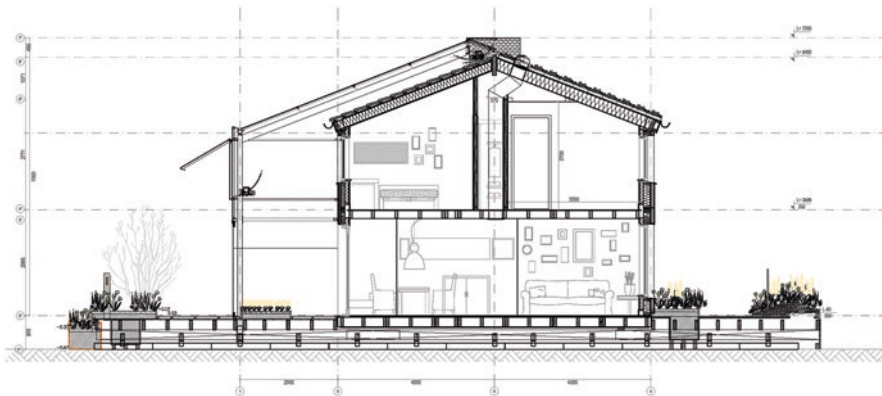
Cross-section of the renovation plan (TU Delft Prêt-à-Loger team 2014)
